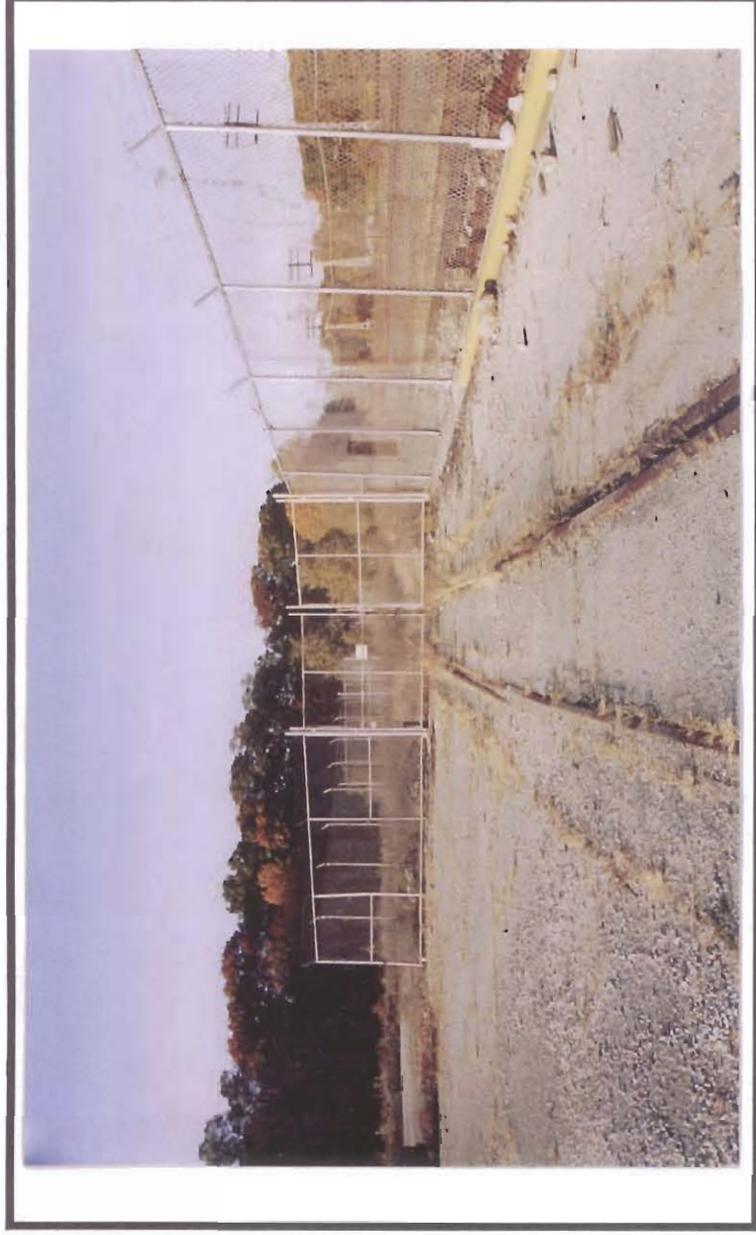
Rail spur into site. It was in this area that, after the construction of the railroad, the Pocantico River entered the Hudson. Construction of the Fisher Body Plant in the early 20th century caused the Pocantico River to be relocated to the north. View to north.
